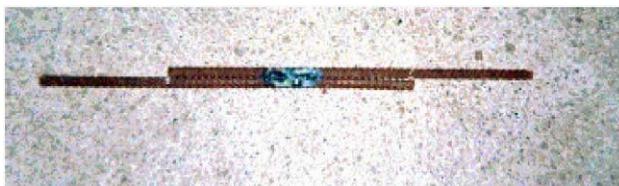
Single flare-V-groove weld for 8 cm weld length.
